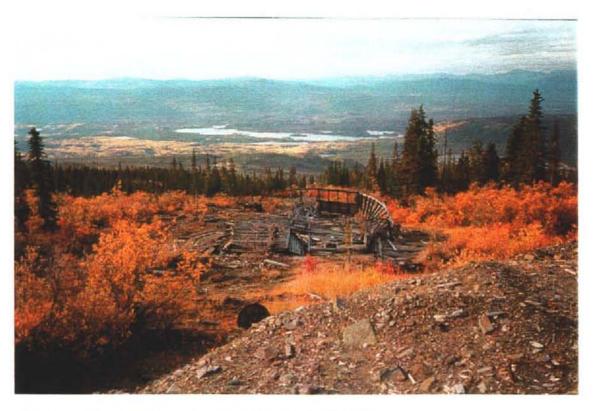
Collapsed building (Bldg. 21-J). (Azimuth 320°)
